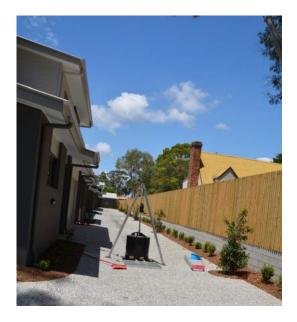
Townhouse development at Ormiston, QLD, showing driveway area, landscaping and filter cartridge for installation.
